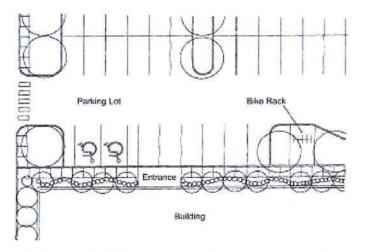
Example of Bicycle Parking and Pedestrian Crosswalks
